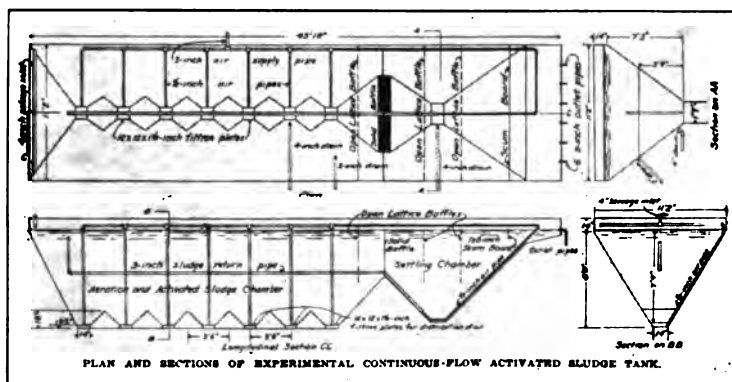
and b. Houston, Tex. Plans of activated sludge plants.
